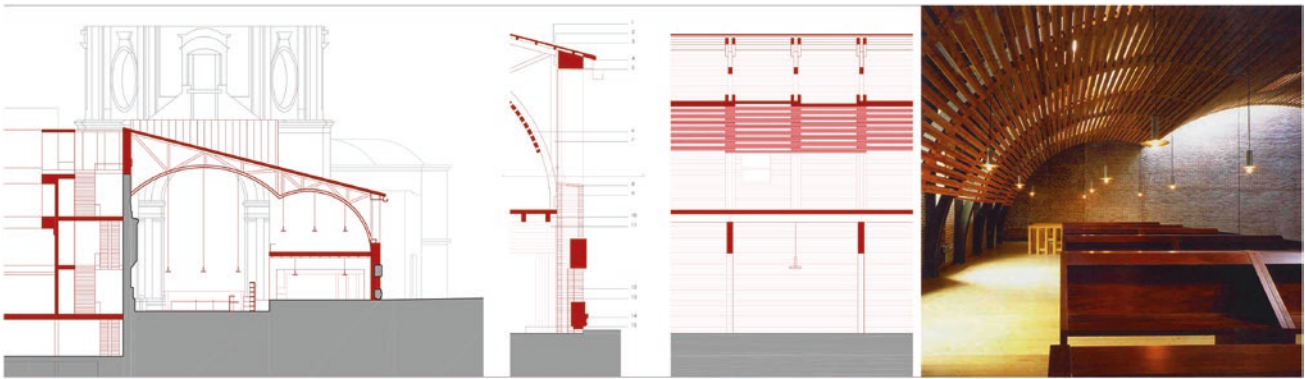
Transversal section and plans of new vaults; author's own, 2013. Interior view of the wooden vaults, Linazasoro (2006)
